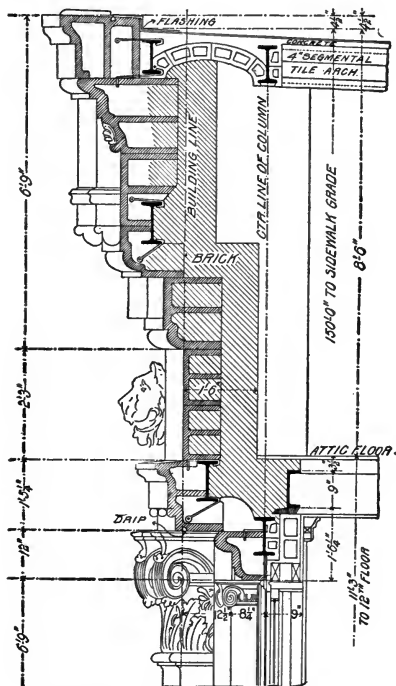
Spandrel Section, Roof and Cornice. Fort Dearborn Building.
